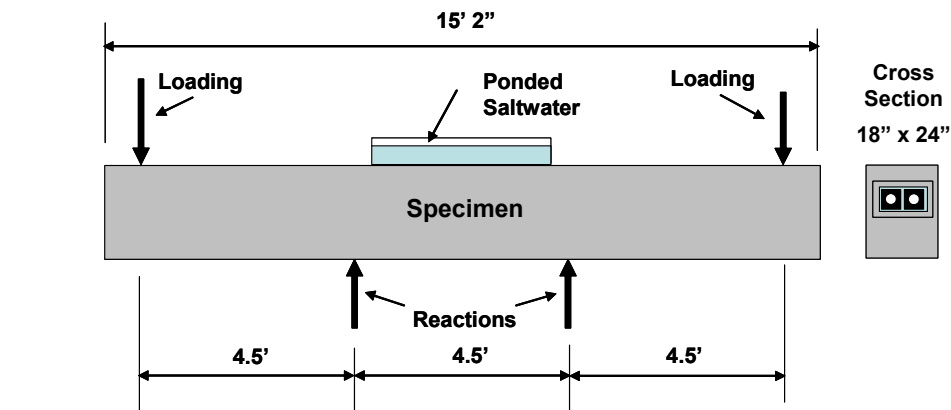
Linear Rectangular Beam Specimens (on Top of Reaction Beams)
